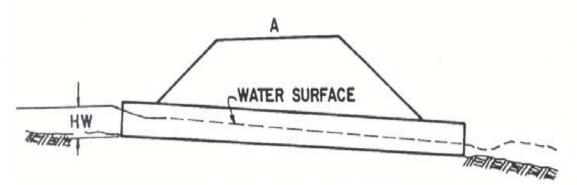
Inlet and Outlet Unsubmerged [Source: FHWA, 2005].
